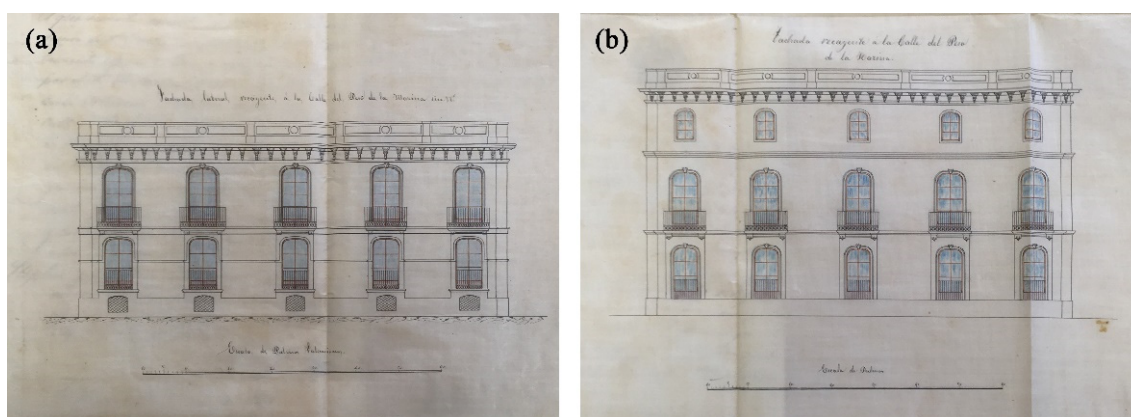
(a) First proposal for the western façade, dated June 1863. Semi-basement, ground floor and main floor (this solution was not built); (b) Second project proposal for the western façade, dated December 1863. Ground floor and two floors. Architect Manuel Ferrando. Municipal Historical Archive of Valencia, Urban Police box No. 97, year 1863.
